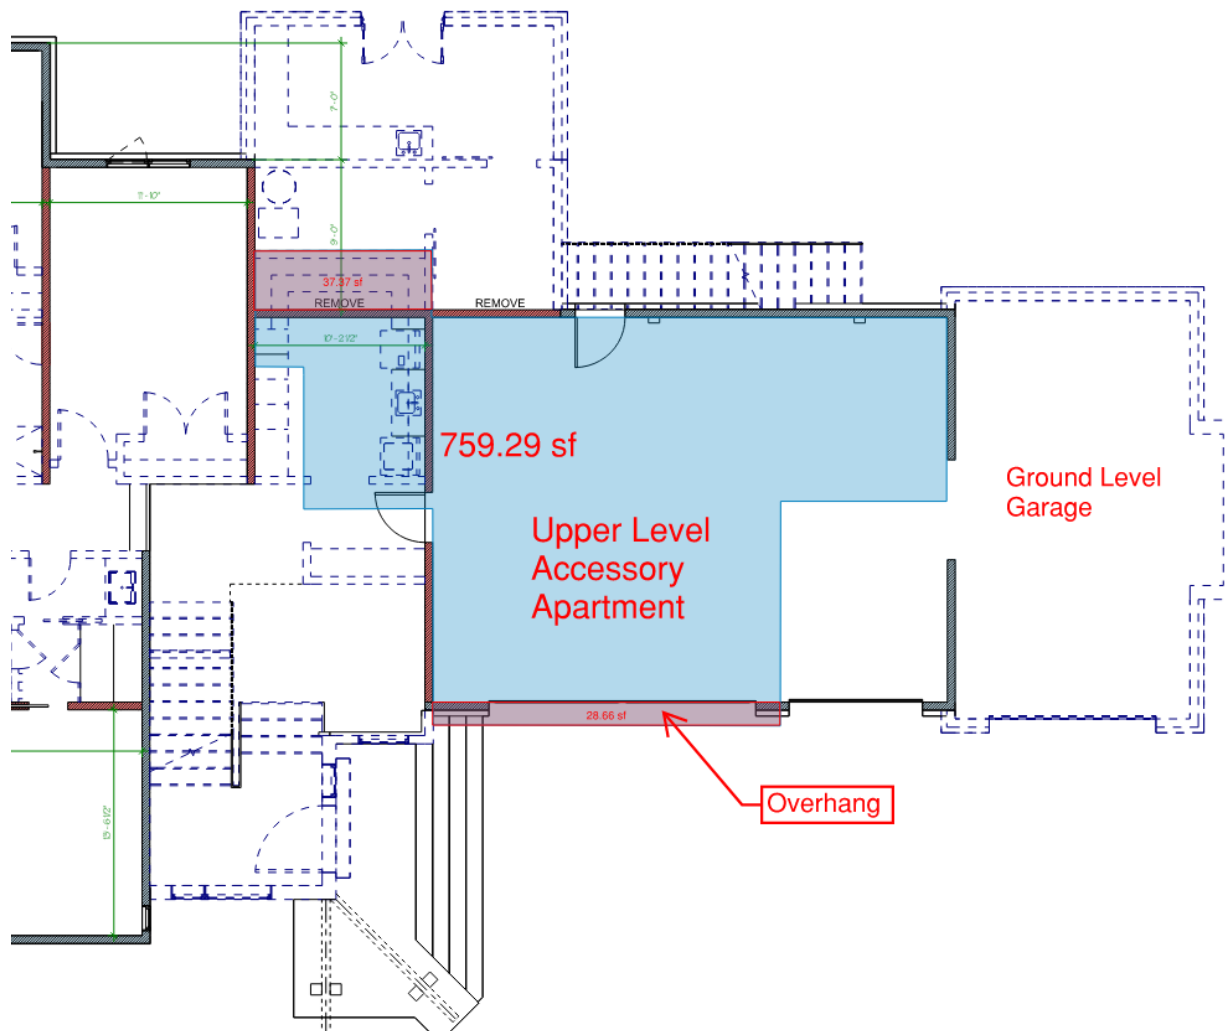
Staff's mark up to the Demo Plan submitted by the Applicant shows the proposed Accessory Apartment overlaid with the existing footprint of the SFD and the proposed remodel/expansion indicated with the dashed lines. The purple shaded rectangles represent the areas of the Accessory Apartment that exceed the existing footprint.
